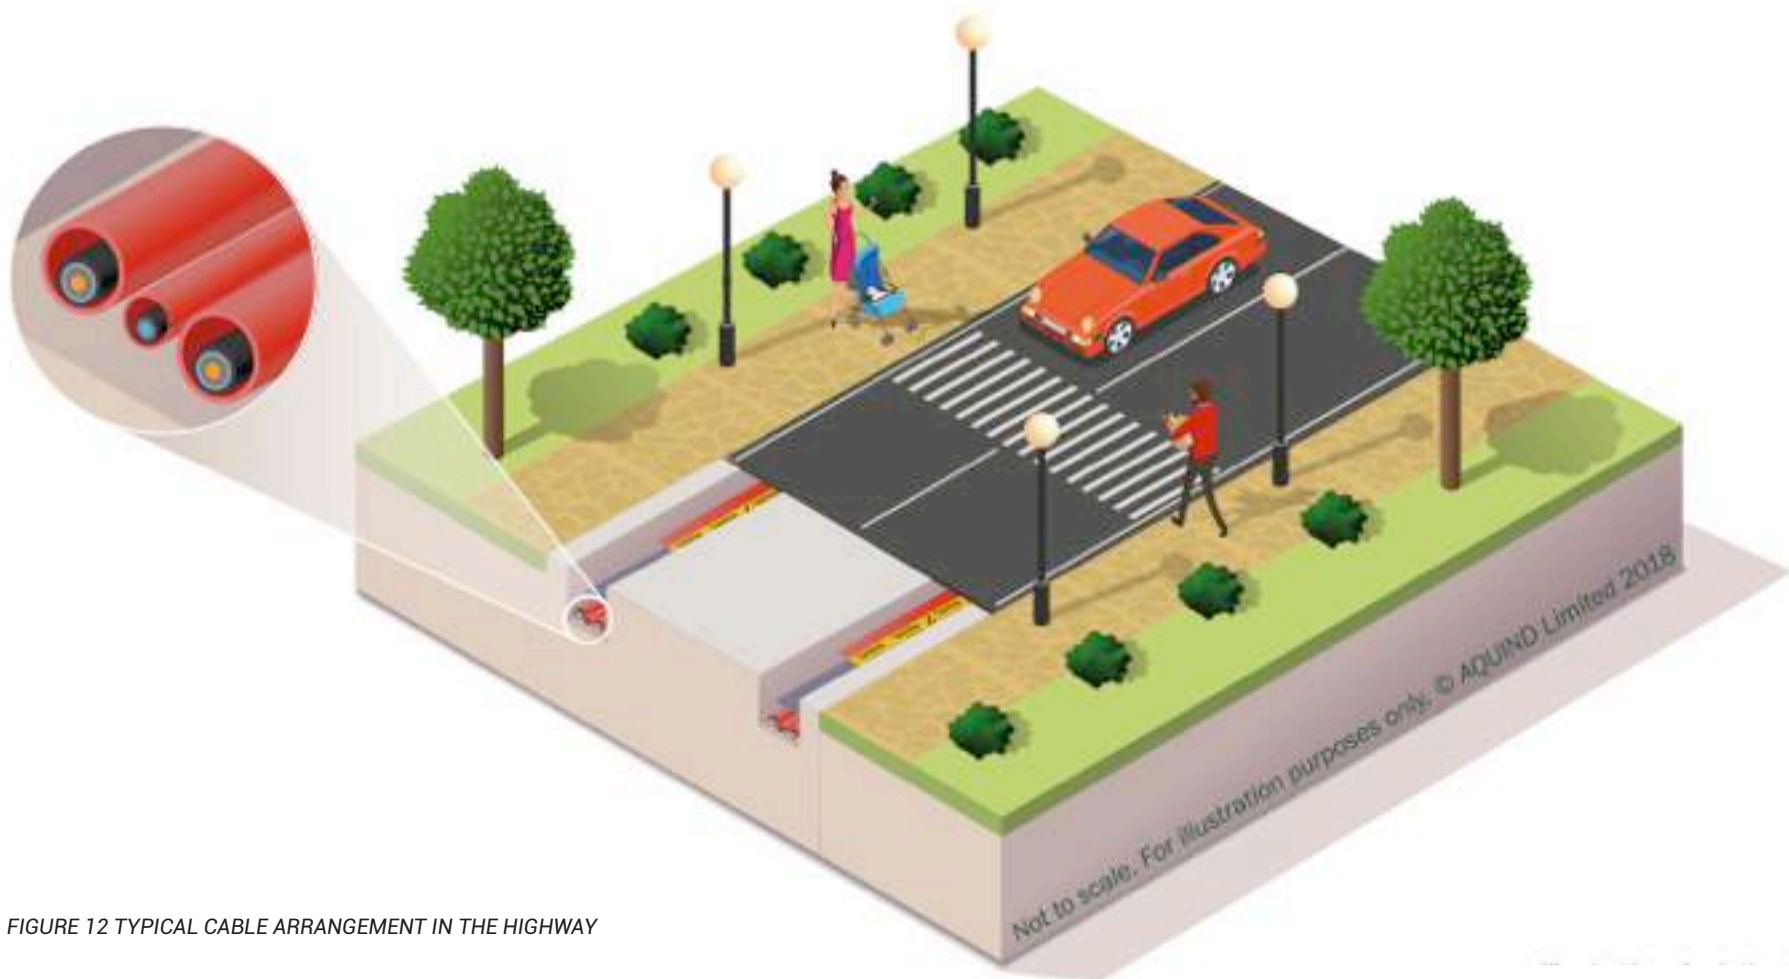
TYPICAL CABLE ARRANGEMENT IN THE HIGHWAY
